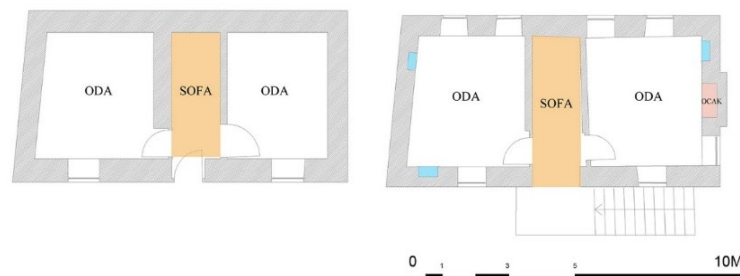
Plan type with “middle sofa” type house; ground and first floor plans.
